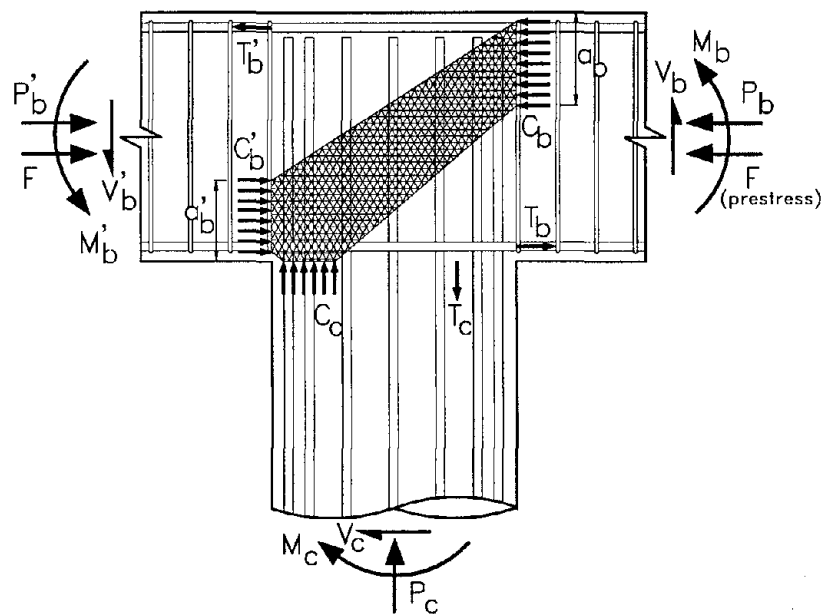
Forces acting on a bridge tee joint with a prestressed cap beam and an idealized joint strut.
